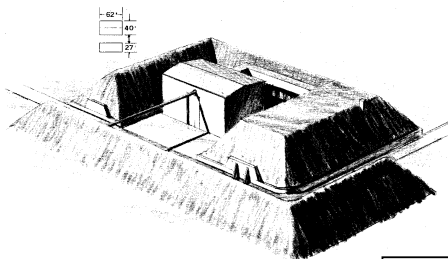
POSSIBLE BATCH MIX/INGREDIENT PREPARATION BUILDING (item 1, Figure 3).
